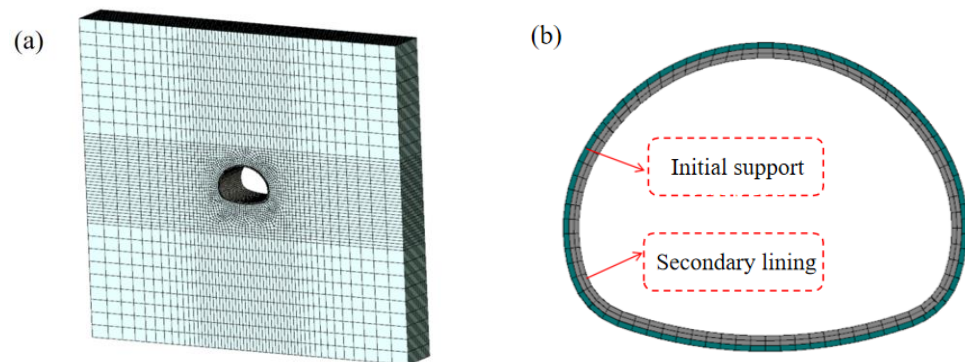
Finite element model: (a) overall model and (b) tunnel cross-section.
